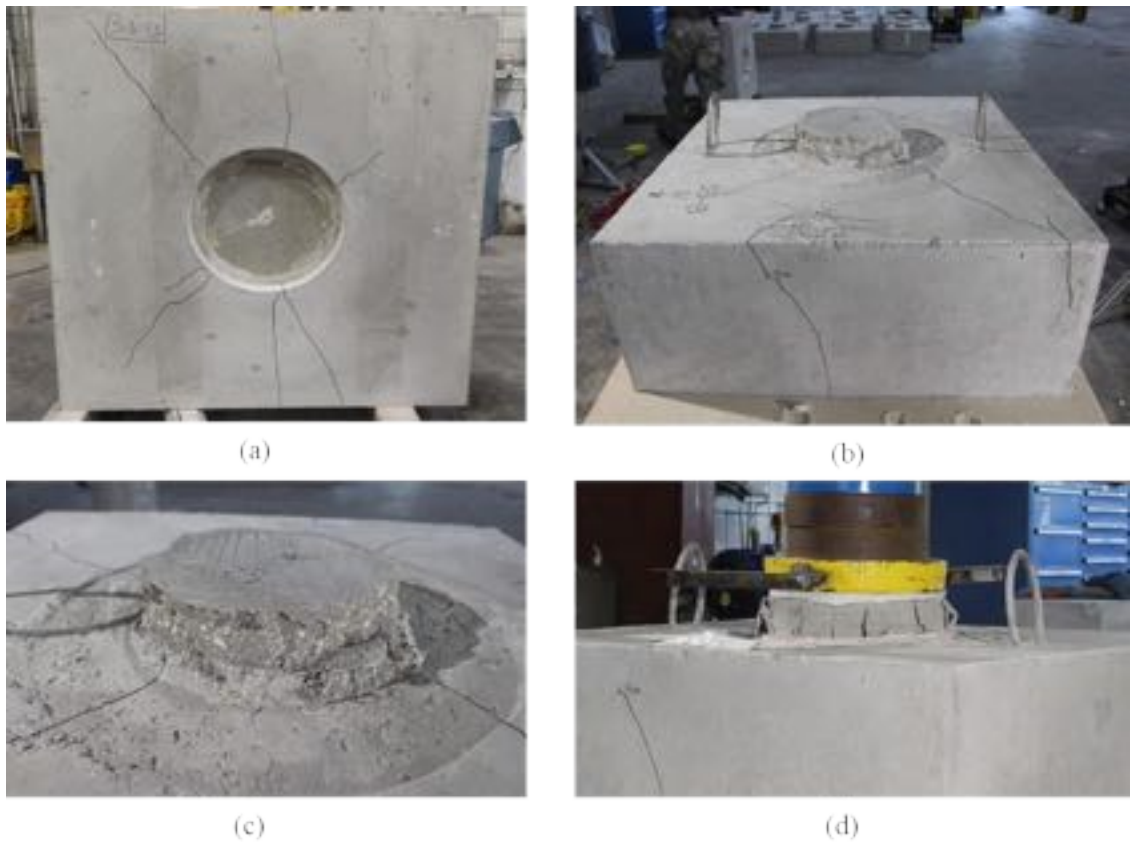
Failure details on (a) bottom, (b) cap, (c) top of plug and (d) plug detail during testing of the Specimen S3-13
